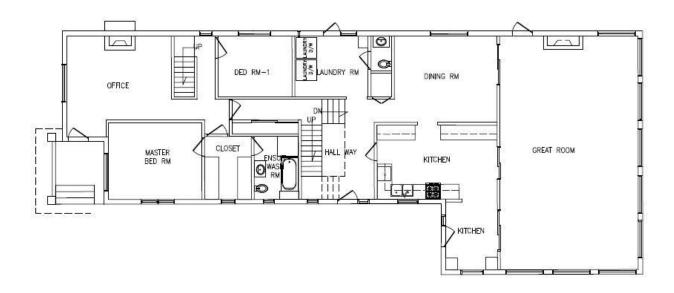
The main level of 347 Queen Street South. (Drawing by client, Jan. 2021.)
